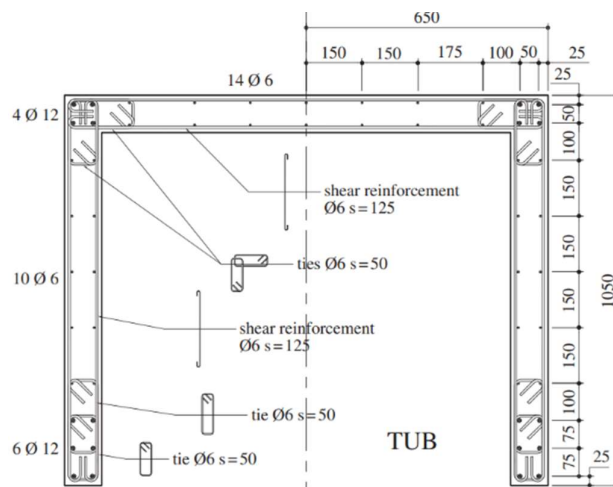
Cross section of the test specimen TUB scale 1:2. Dimensions in mm.(Beyer et al., 2008b)
